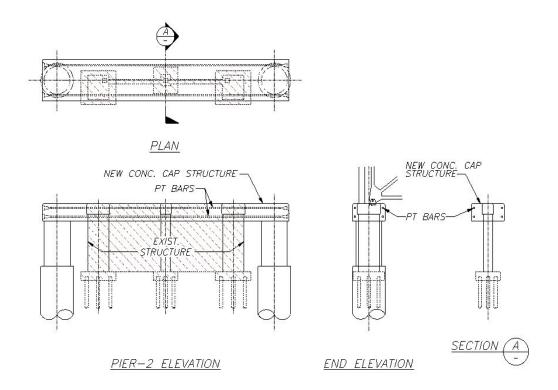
Steel Truss Approach, Pier 2 – Rehabilitation Option 1
